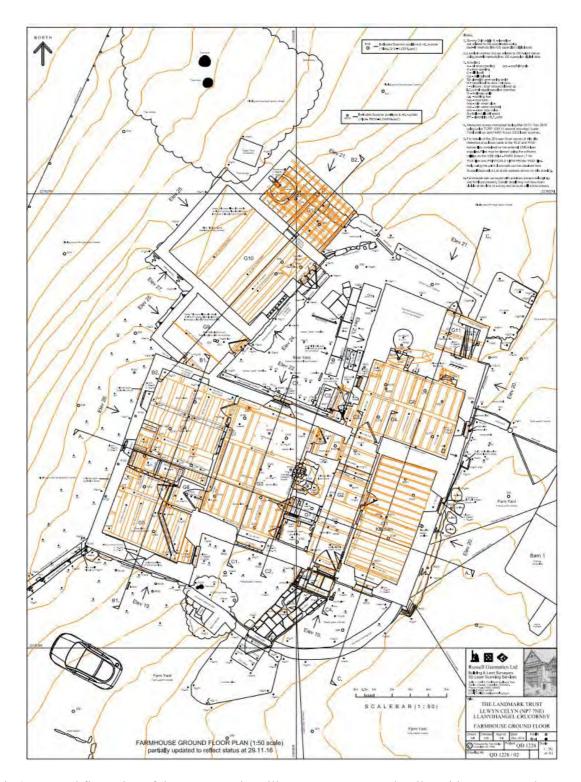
Ground floor plan of the House and ancillary structures – Malt Kiln, Cider House and Lean-to.
